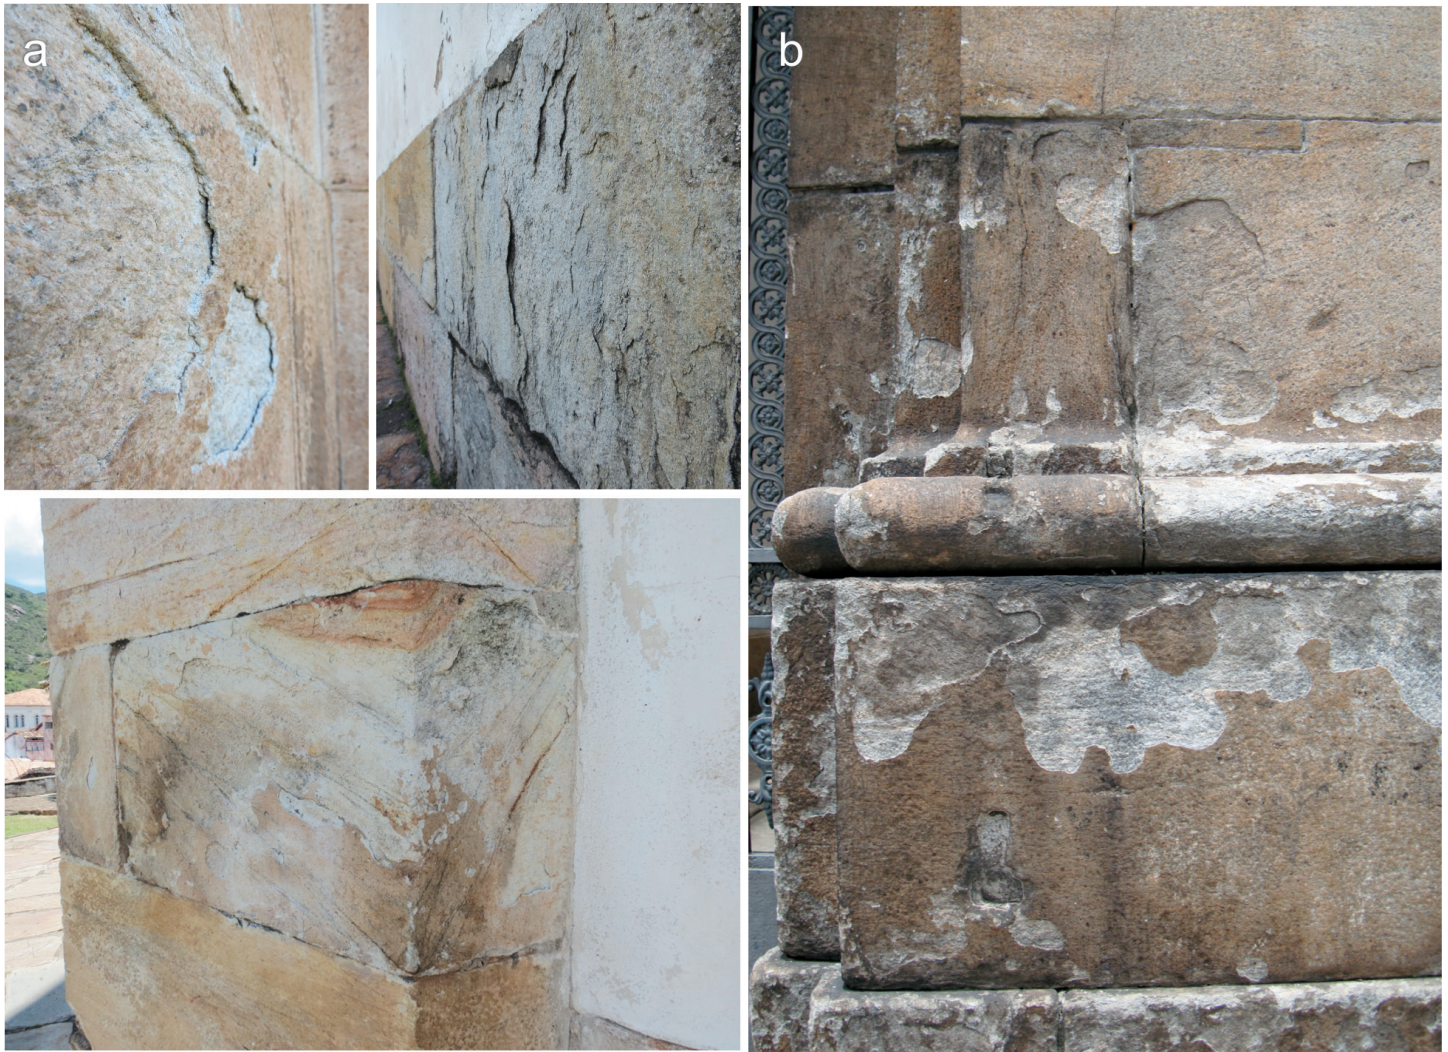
Example of stone detachment as flakes or scales (spalling). In this case, detachment is parallel to the block surface but not to the rock structure, as observed in a) the external and flat wedges of quartzite at the Carmelite Chapel, Ouro Preto, Minas Gerais, and b) gneiss at the Carmelite Church in Rio de Janeiro.
